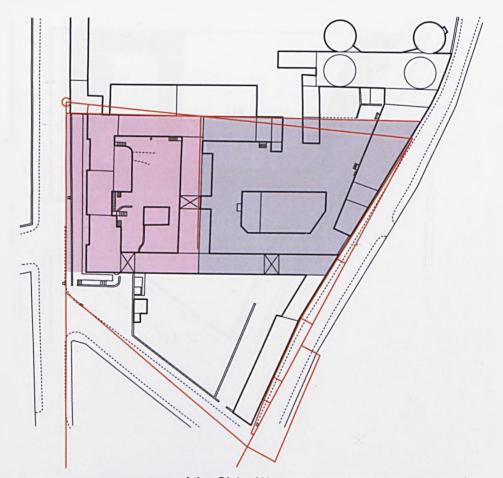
Fairbank setting-out survey of the Globe Works plot made prior to construction (red lines) redrawn and superimposed on the 1836 plan, describing the front and back courtyard areas of the proposed works. Scale 1:1000 (author).
